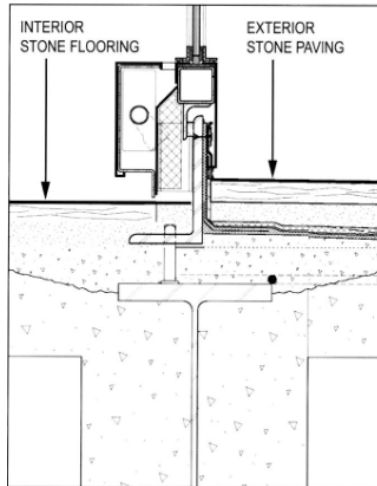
Section detail at lobby storefront at 860-880 North Lake Shore Drive, showing new offset between interior and exterior paving. Drawing by Krueck + Sexton Architects.
